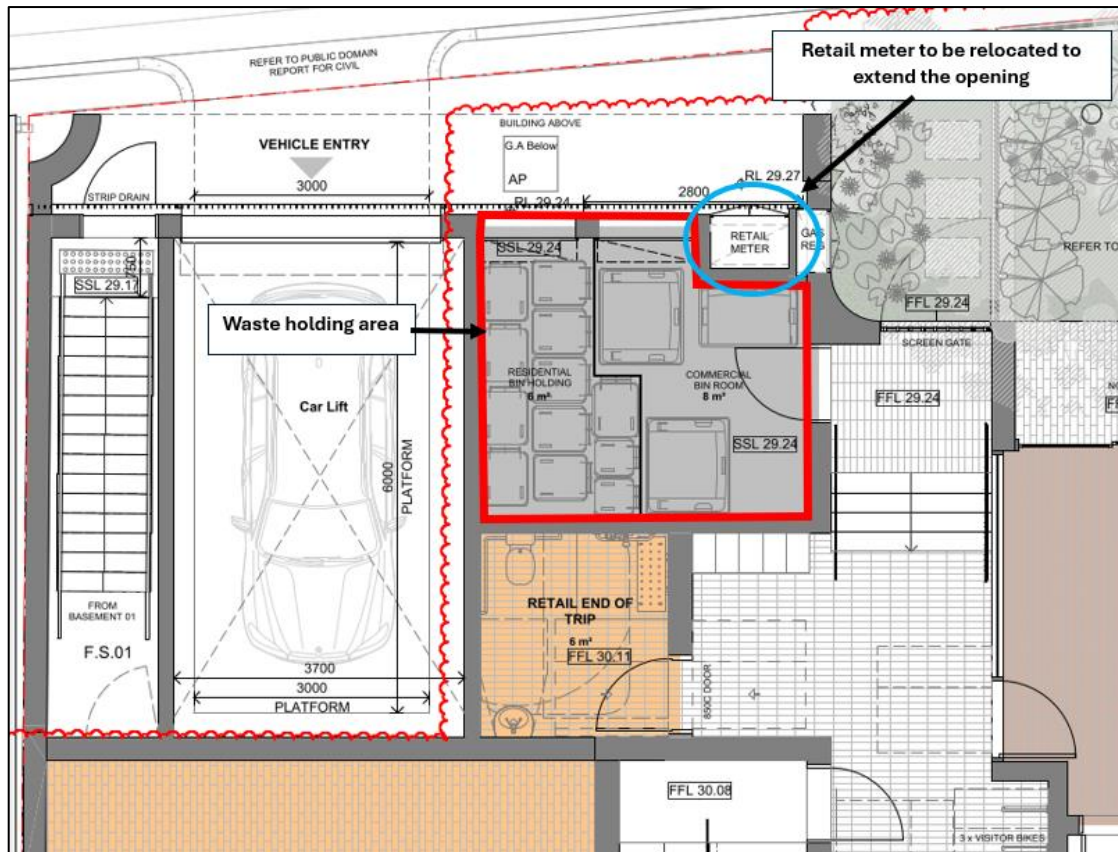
Ground floor waste holding area fronting O'Loughlin Street
